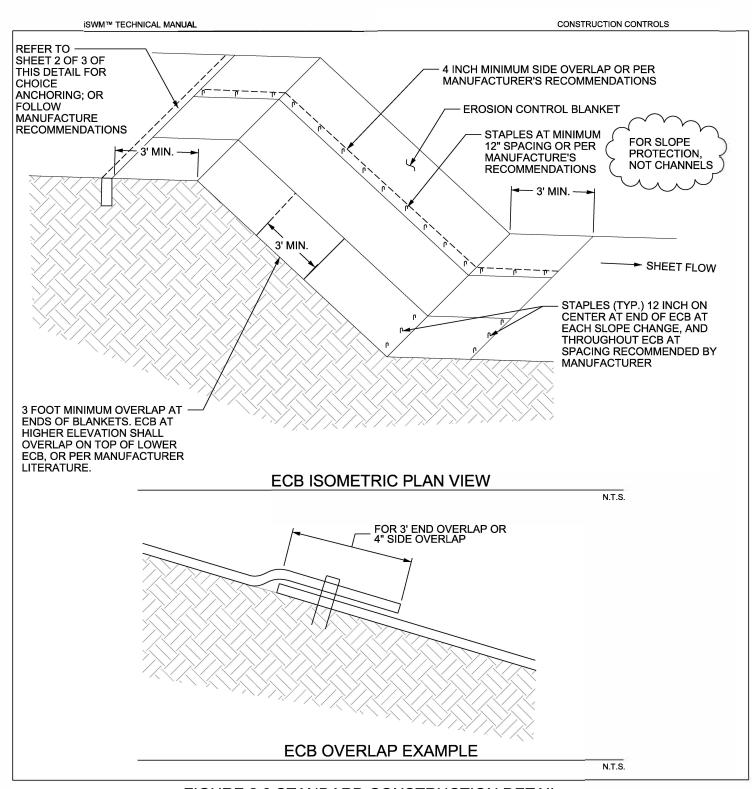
STANDARD CONSTRUCTION DETAIL - TEMPORARY EROSION CONTROL BLANKETS (1 OF 3)
